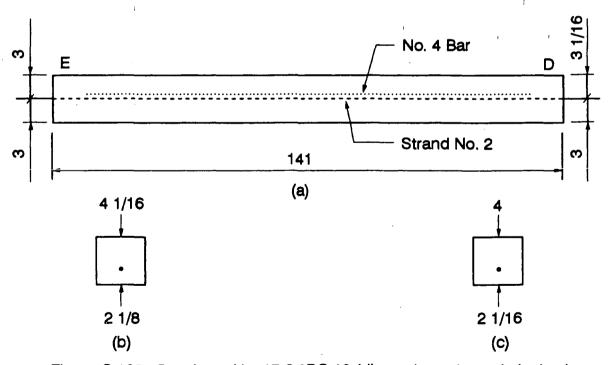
Specimen No. 17-6.0DC-10 (dimensions shown in inches):
